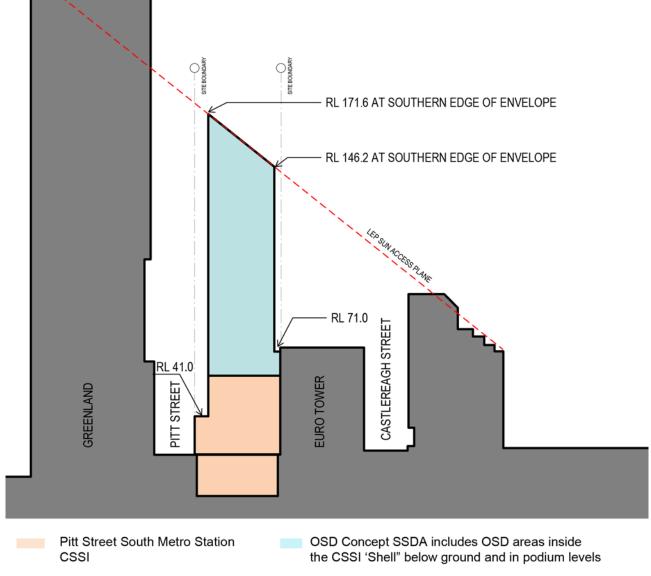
North-South Envelope Section, illustrating Station Envelope (Orange) and OSD (Blue)
